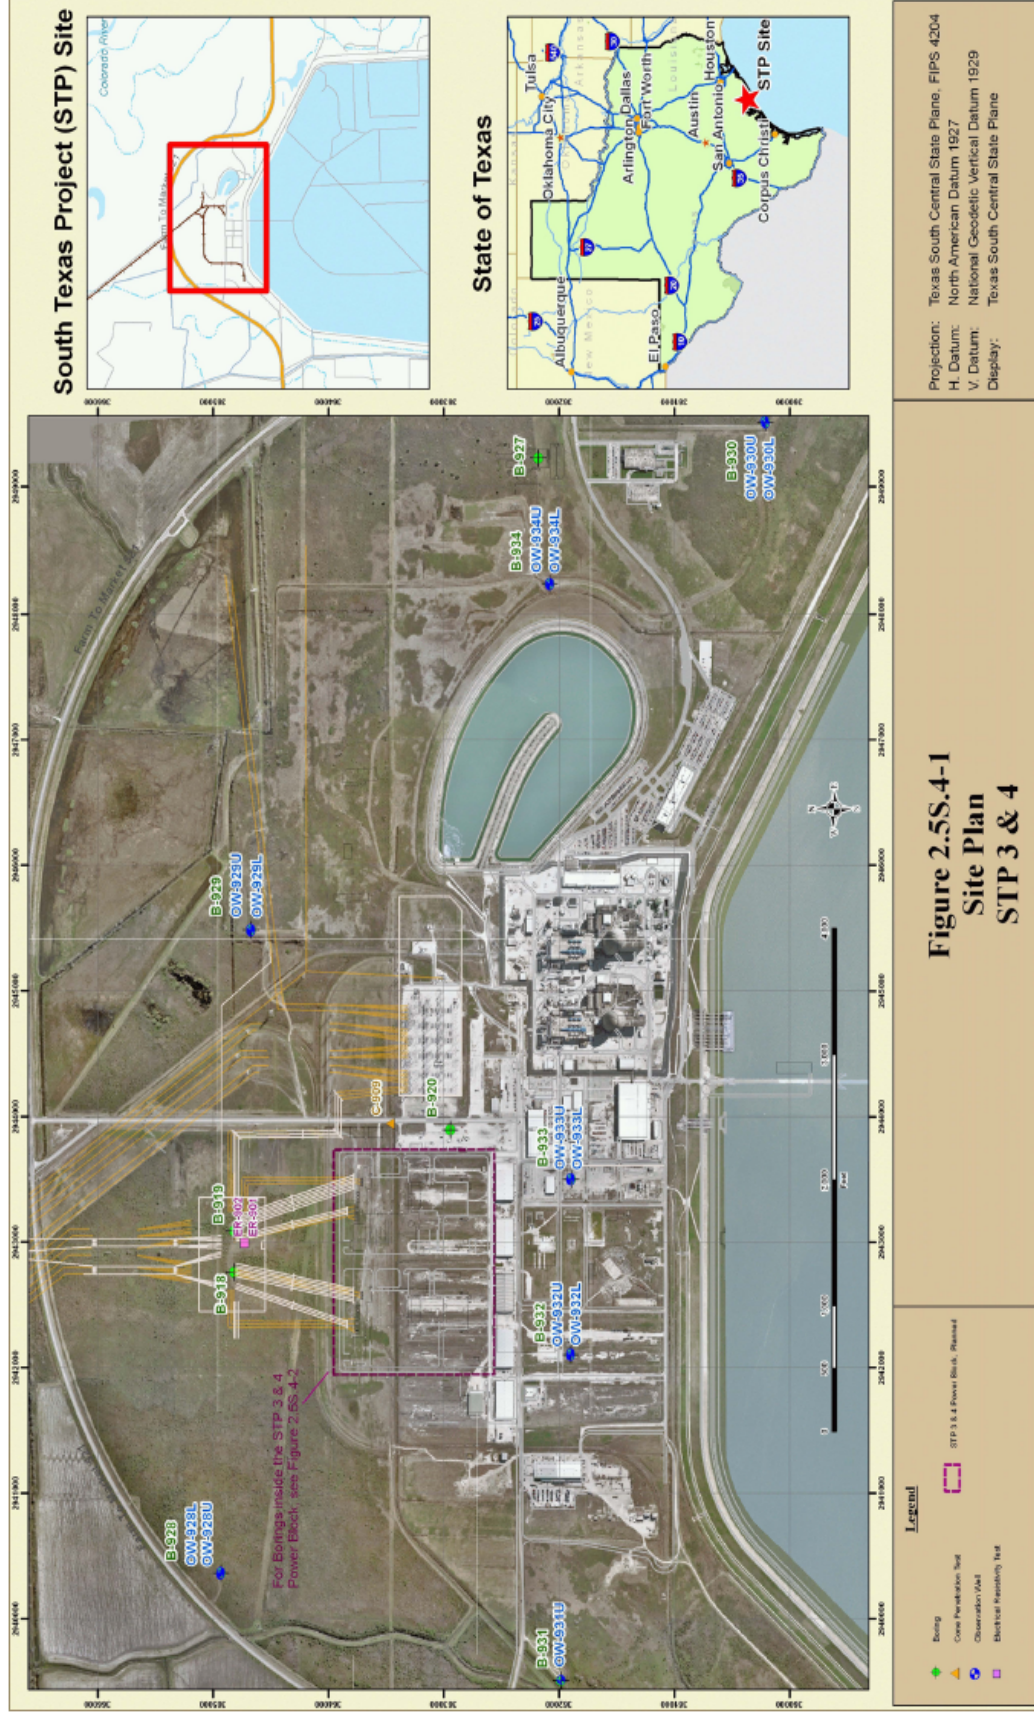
Site Plan including Location of the Main Cooling Reservoir Embankment (FSAR Figure 2.5S.4-1)
